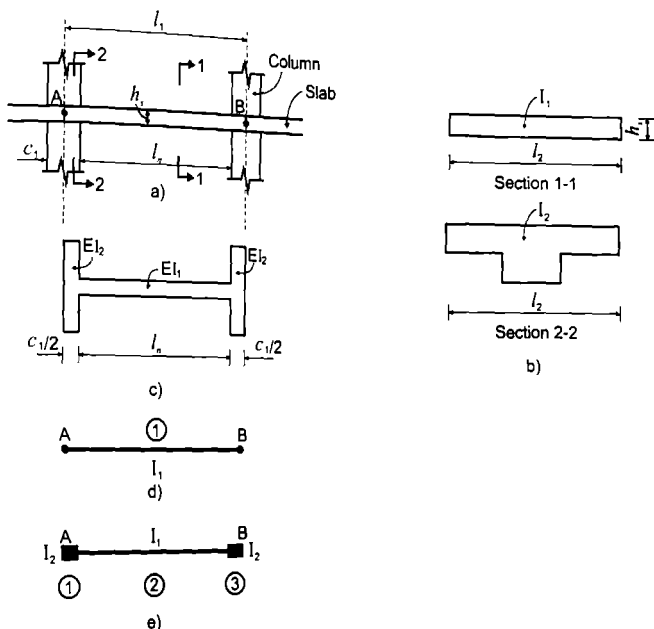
Modelling of slab-beam properties - elevation view: a) a typical slab span; b) cross-sections; c) variation of stiffness along the span; d) prismatic model, and e) non-prismatic model.
